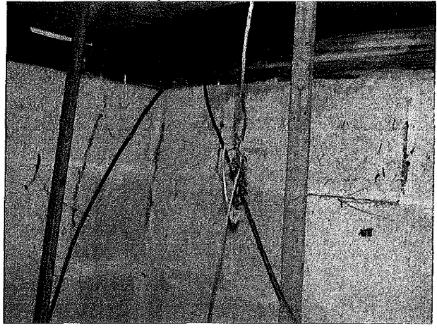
View of a crack in a foundation wall within the crawlspace area beneath the building. Note the water mark on the foundation wall.
